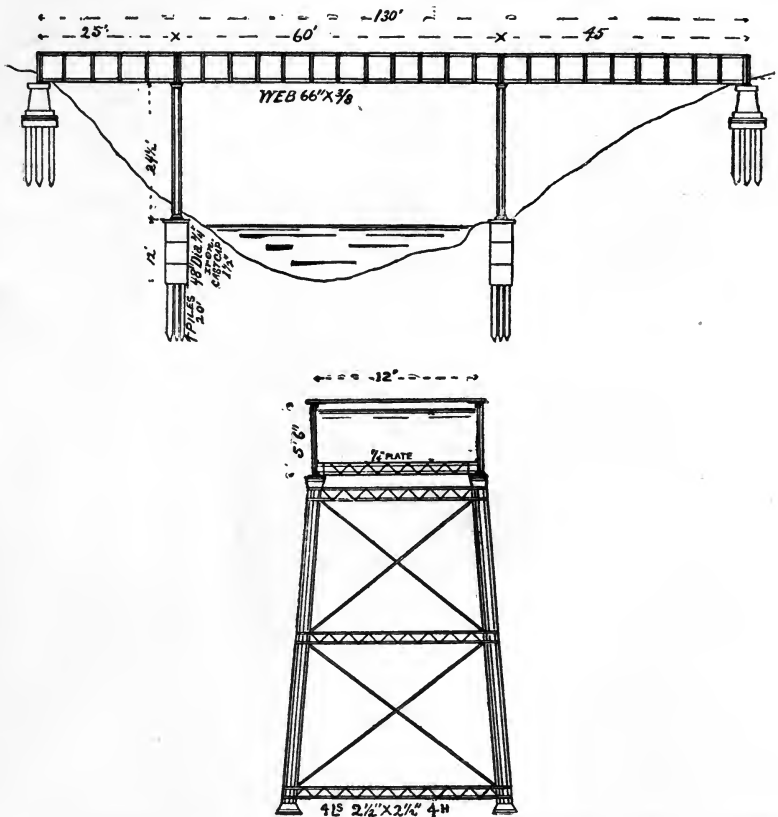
BEAR RIVER CANAL. ELEVATION AND CROSS-SECTION OF IRON FLUME ON CORINNE BRANCH.
